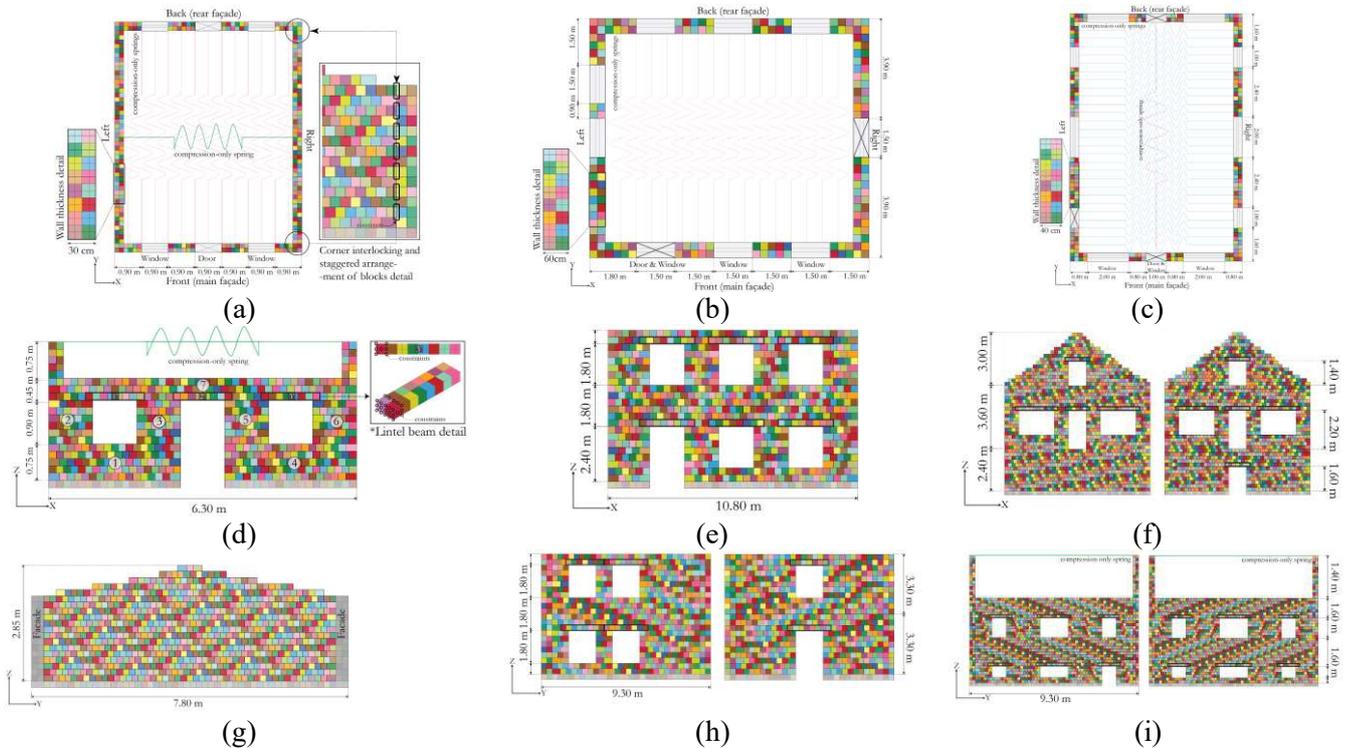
(a, b, c) Plan view showing dimension and features that are modelled in the LS-DYNA environment. (d, e, f) Elevation view of the main and rear facades. (g, h, i) Elevation view of the left and right walls.
